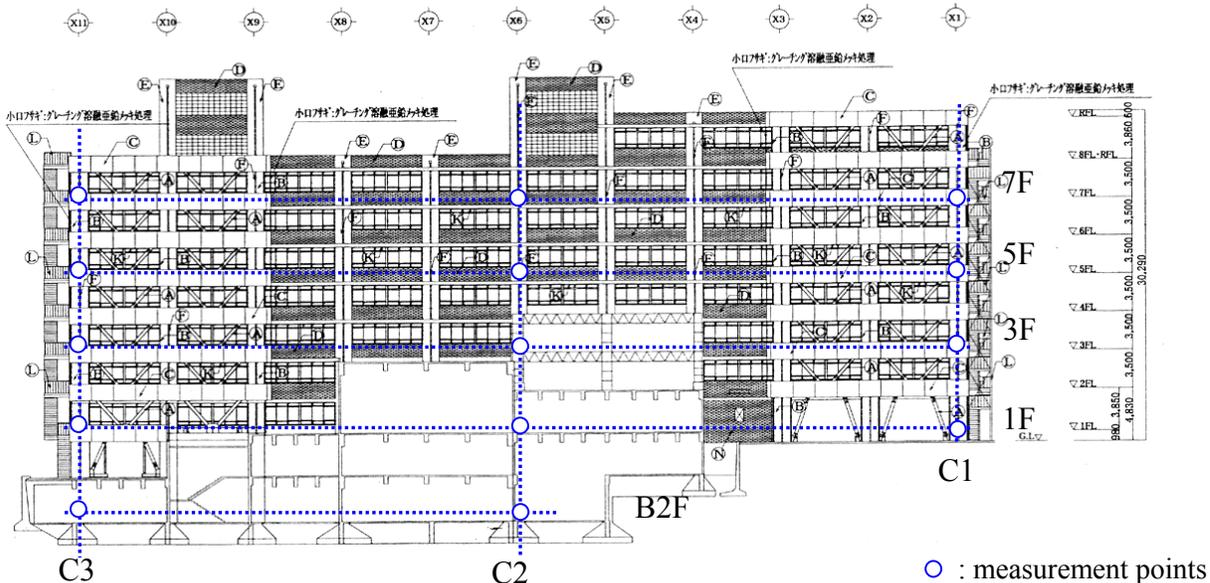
North elevation of the building after retrofit and measurement points for ambient vibration test
